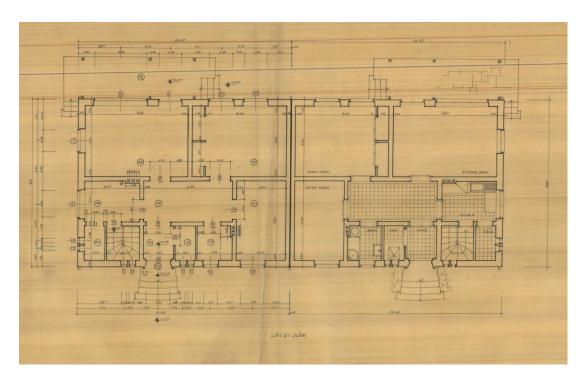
The implemented drawing of the double dwellings of officers, the ground floor plan, Mehmet Güney, Construction Section in General Directorate of TEKEL, 09.05.1947 (Source: TTA Archive)
